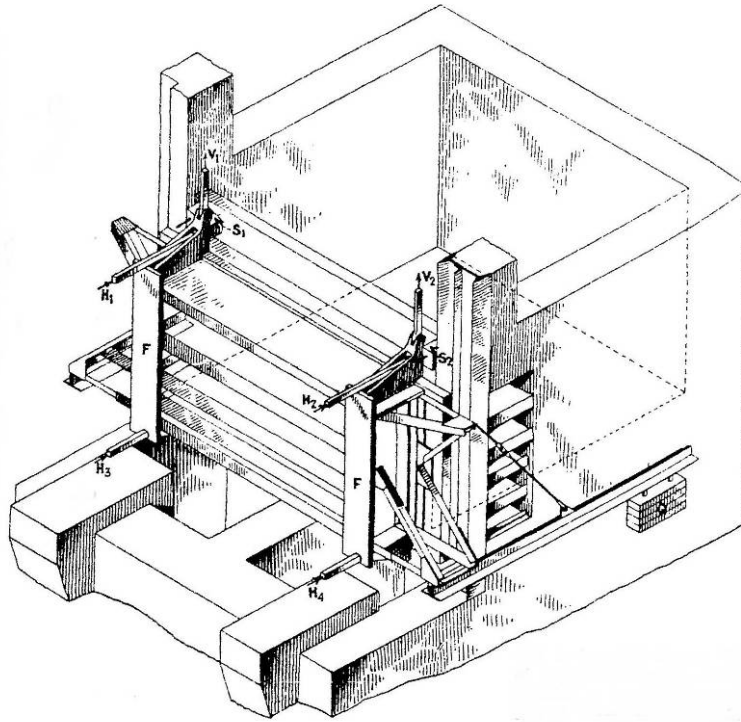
MIT model retaining wall (after Terzaghi, 1932)
